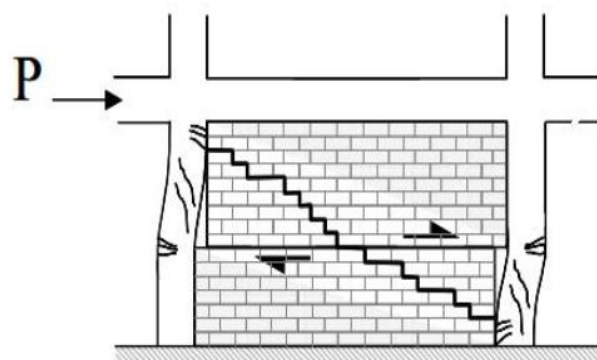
10 Shear failure of masonry (Al-Chaar, 2002)
